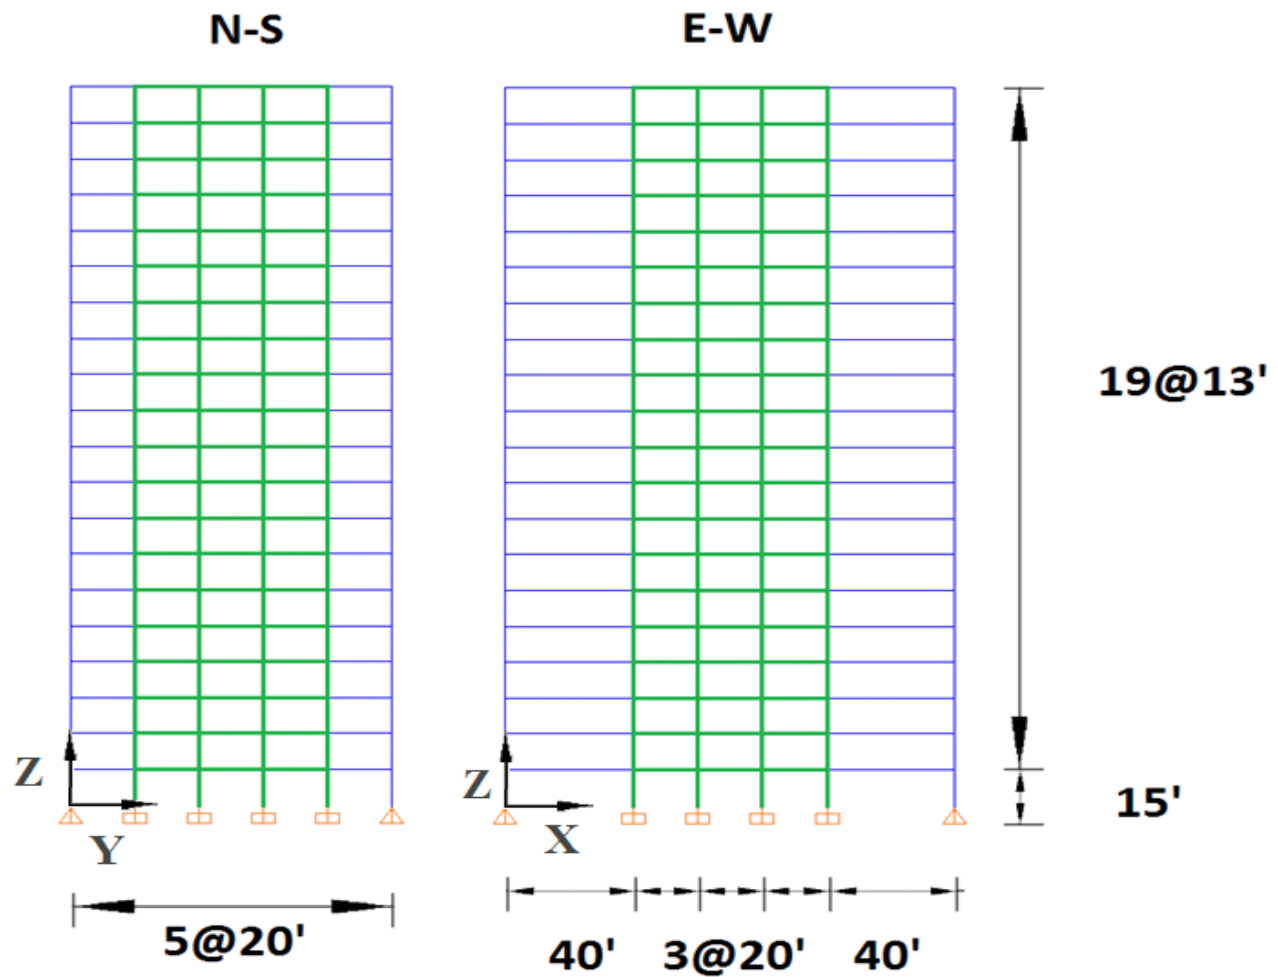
E-W and N-S elevation views of the 20-story office building. The special steel moment frames are highlighted in green.
